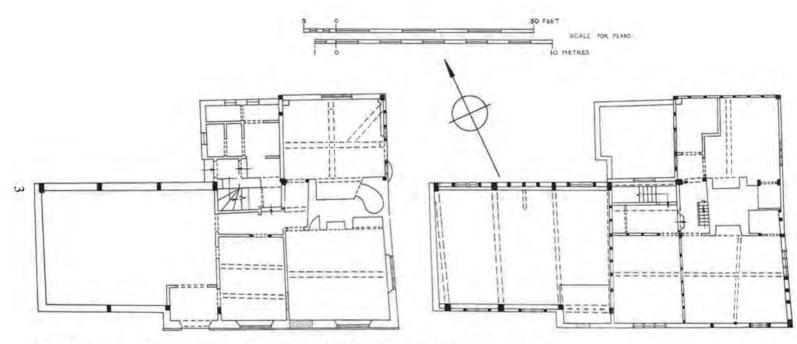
Rectory Cottages, Bletchley: ground-floor plan (left), first-floor plan (right); hall to left.
